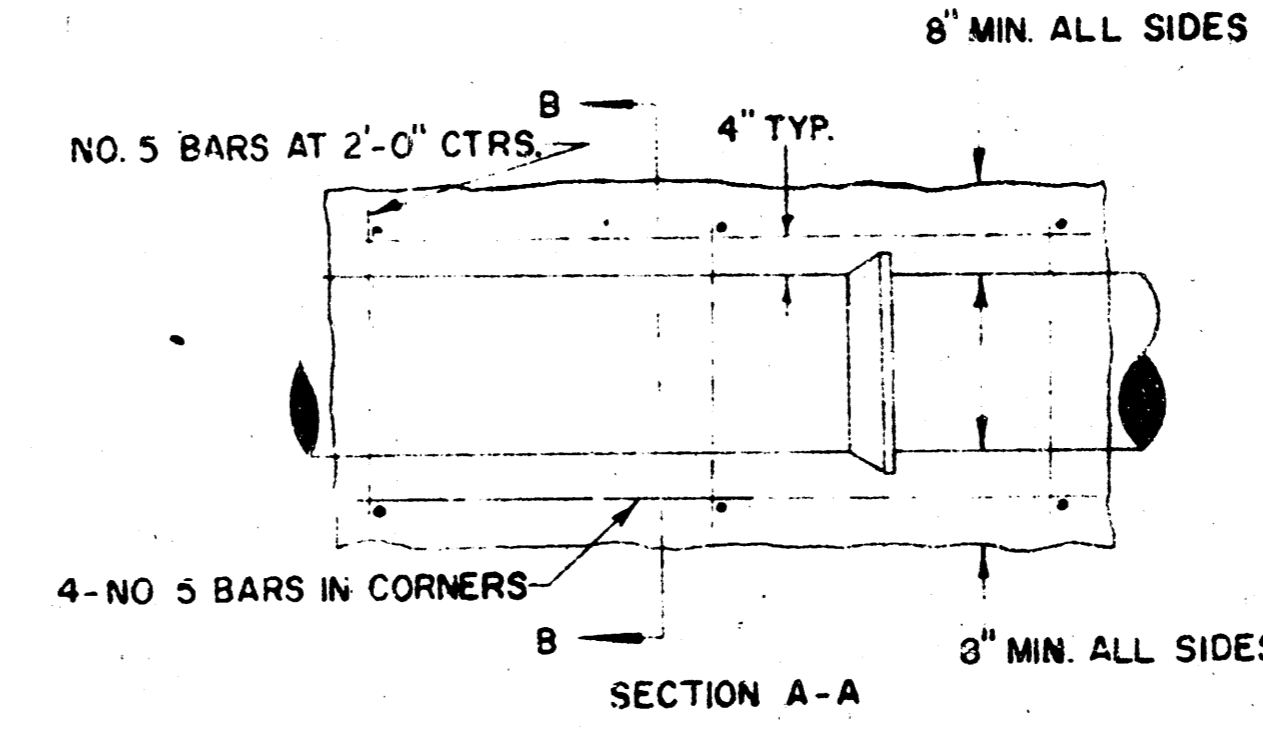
DETAIL OF DROP STACK FOR EXISTING MANHOLES IN GROUND WATER
